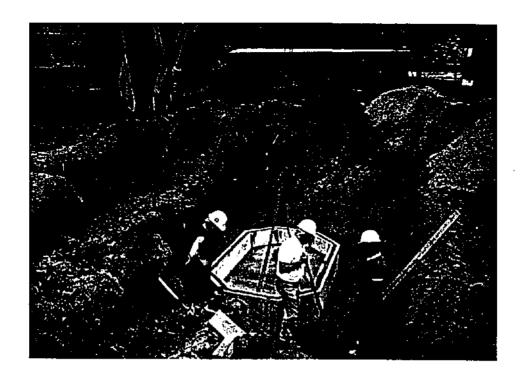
North Bloomfield, N.Y. 7/16/87. A concrete block (base) is being placed in the meter pit at Martin Road.
